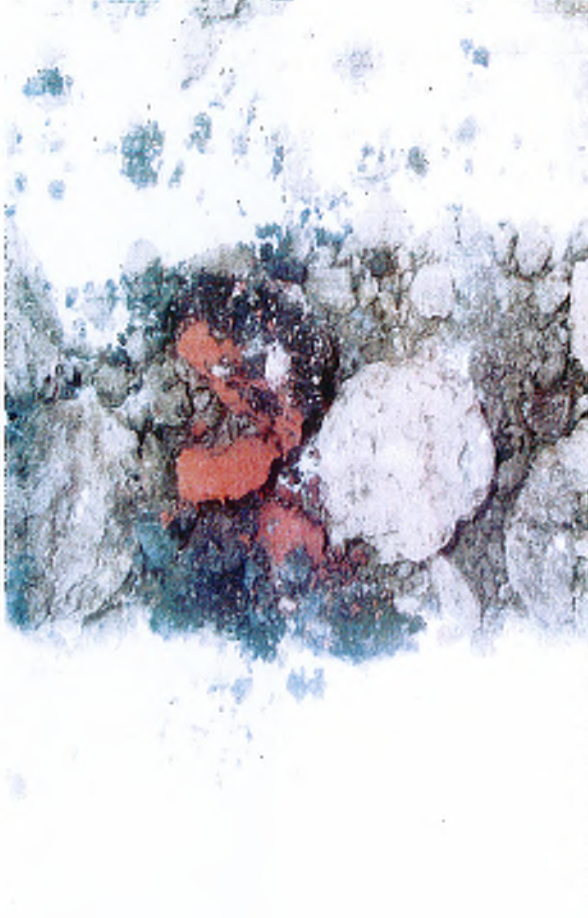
Looking at wood and metal that were collected in Boring S1-3.
